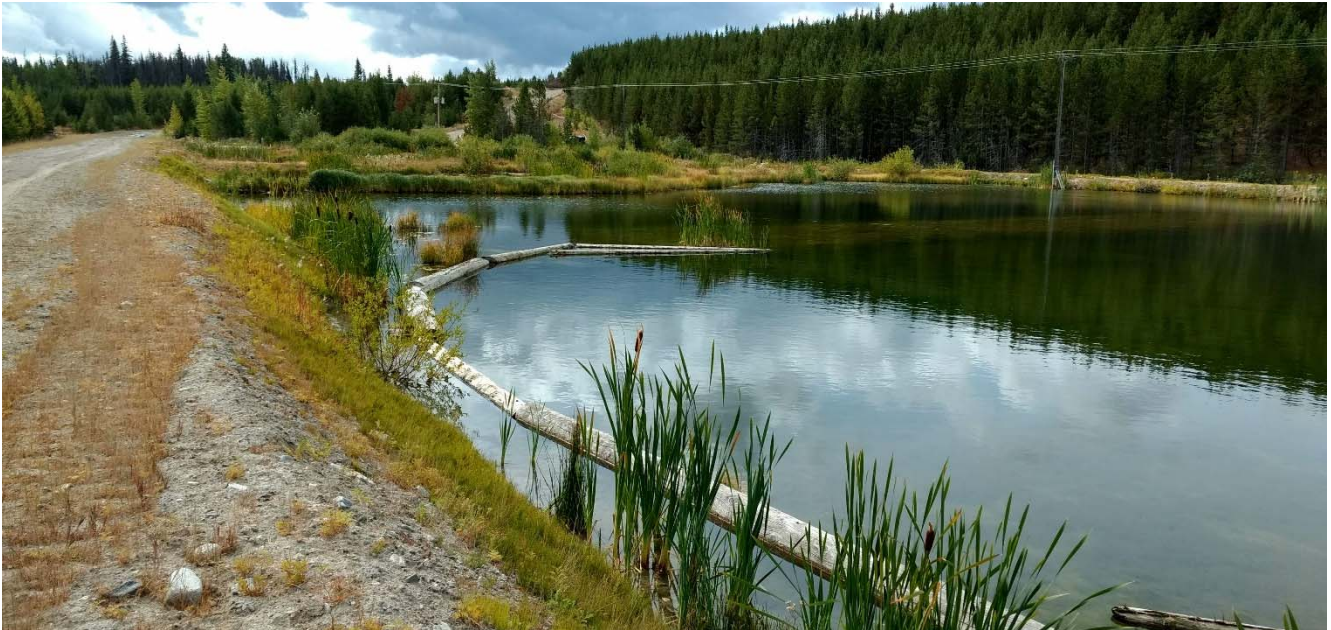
S1: spillway outlet. (HGH-2017-27)
